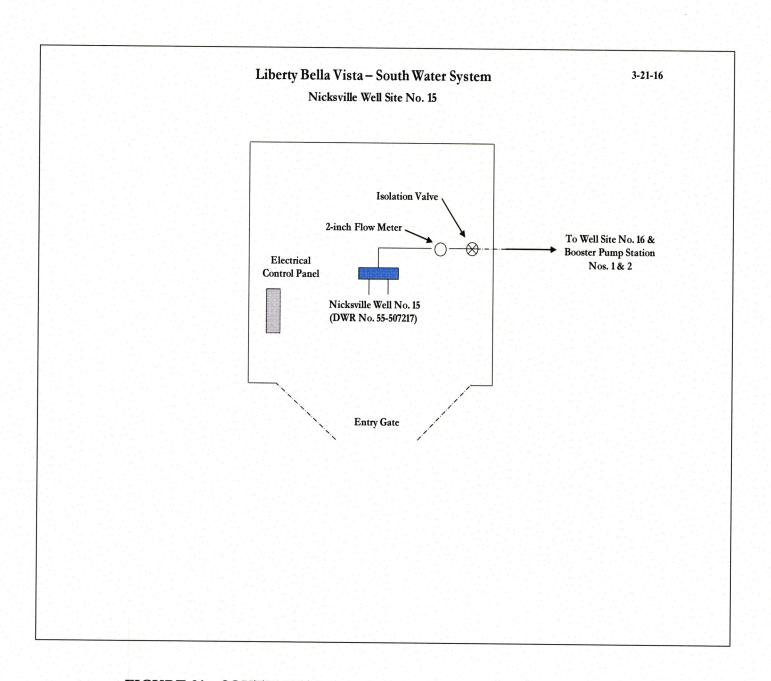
SOUTH WATER SYSTEM NICKSVILLE WELL SITE NO. 15
